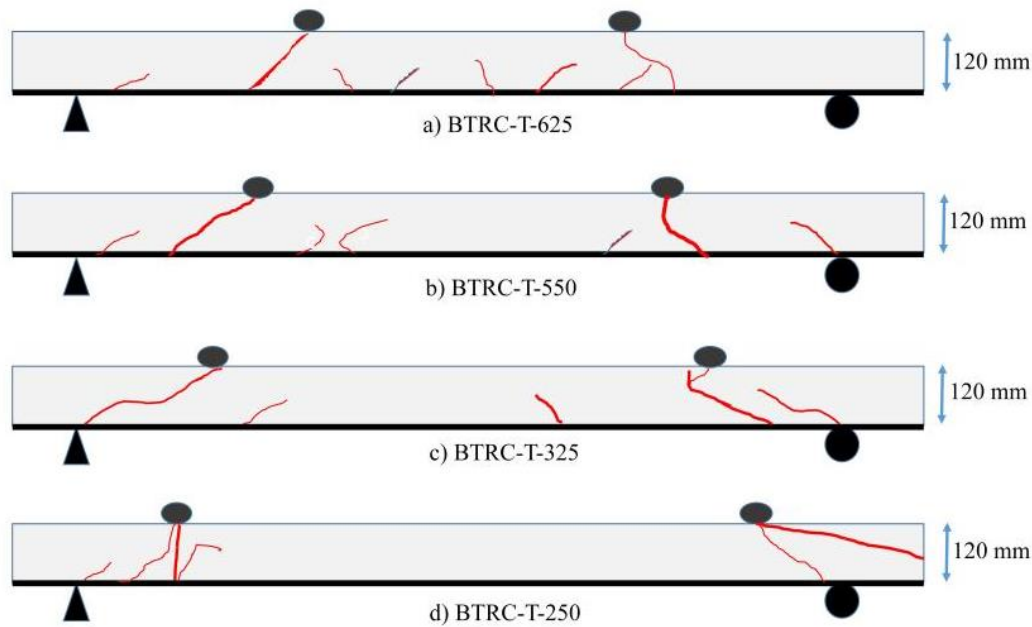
Crack patterns in BTRC-T composite slab specimens.
